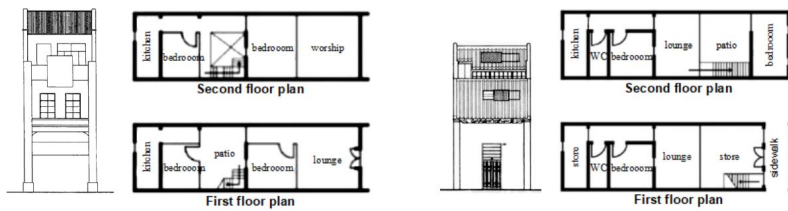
Facade and Plan of Arcade Buildings (Left) and Traditional Residences (Right)
